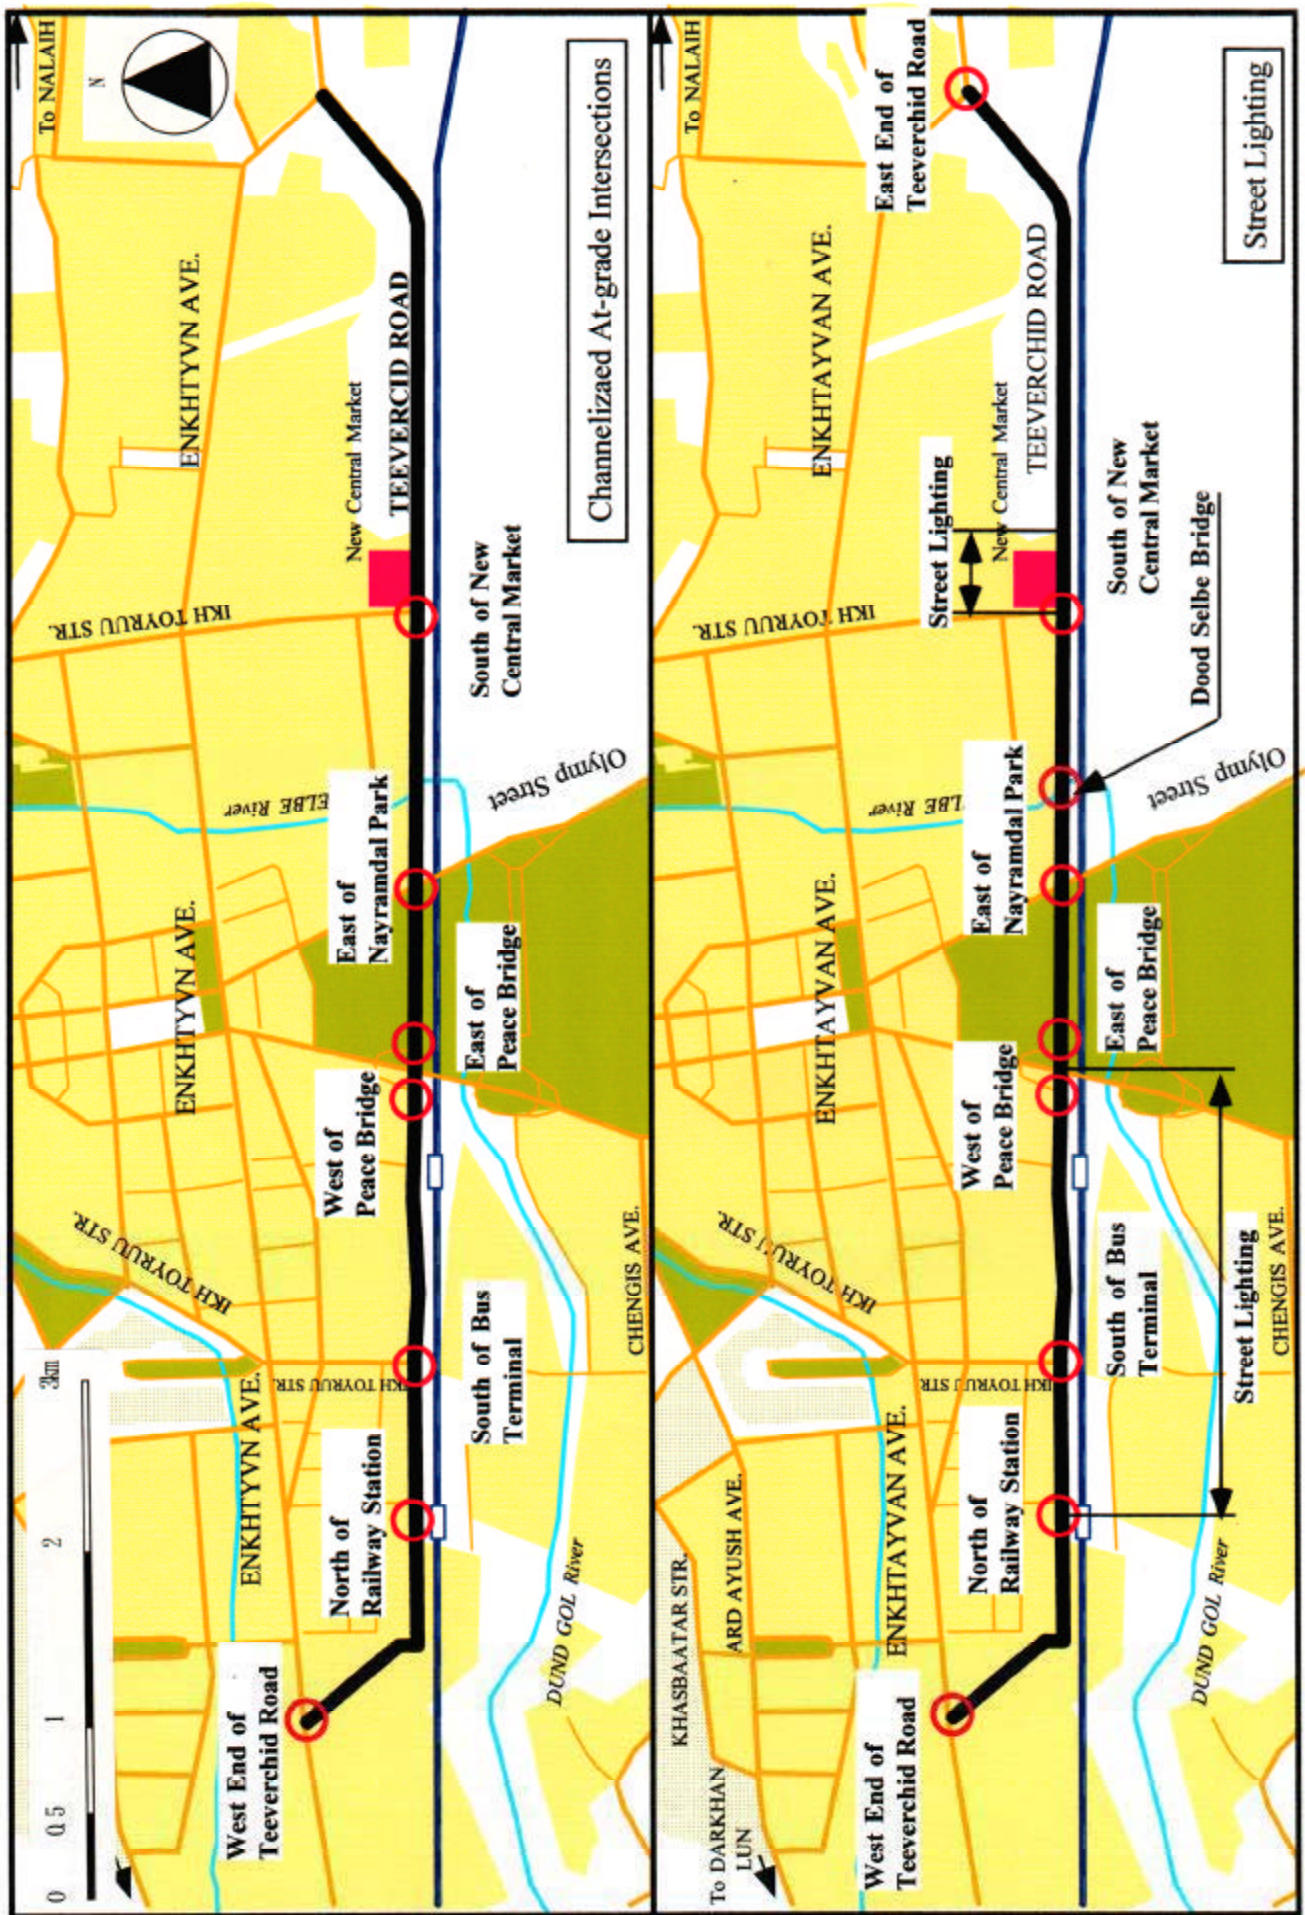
Location of Channelized A-grade Intersections and Street Lighting
